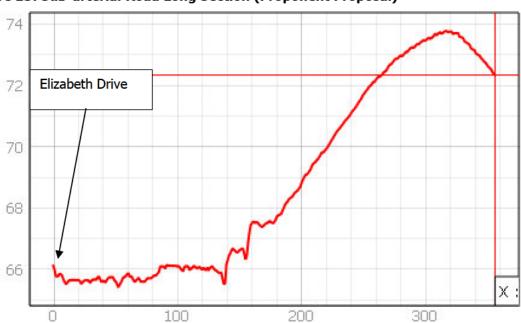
Sub-arterial Road Long Section (Proponent Proposal)
